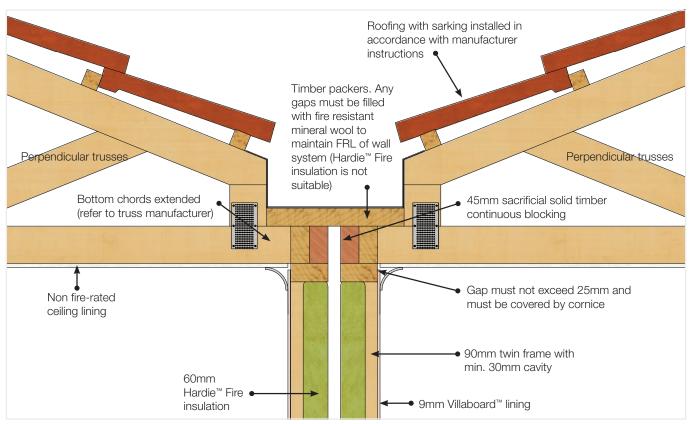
HARDIE™ SMART INTERTENANCY WALL SYSTEM TO GUTTER BOX WITH PERPENDICULAR ROOF TRUSSES
